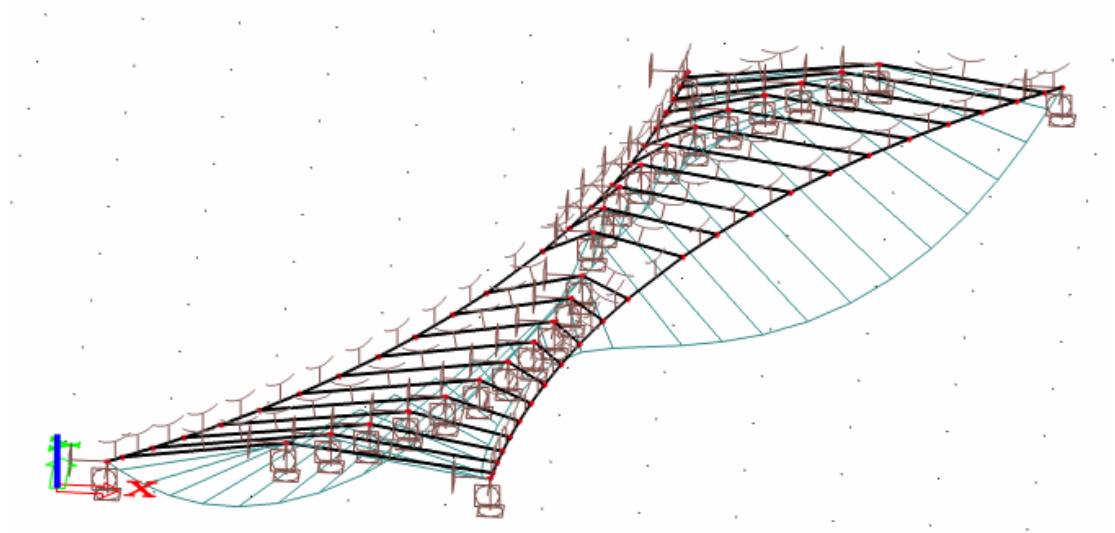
DEFORMED STRUCTURE 3D VIEW
